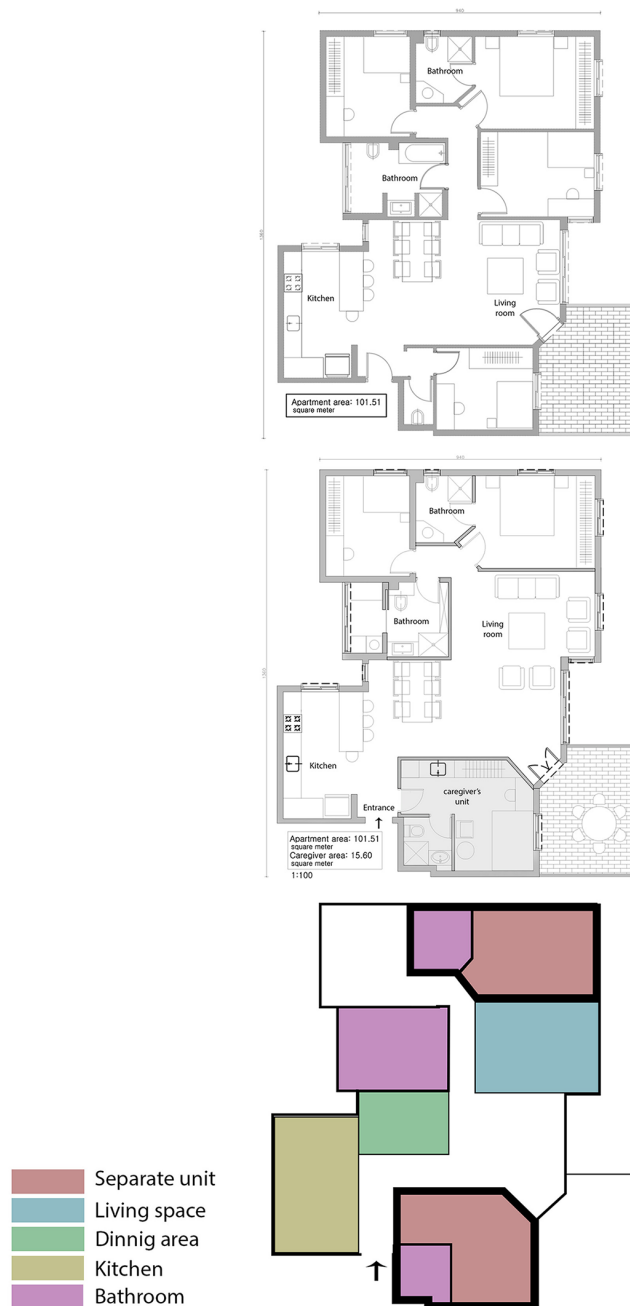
Architect M. Kaplan's proposed layout of an apartment in Tel Aviv. Graphics by Shahr Malka. In the figure, see the original plan above and suggested plan below.
